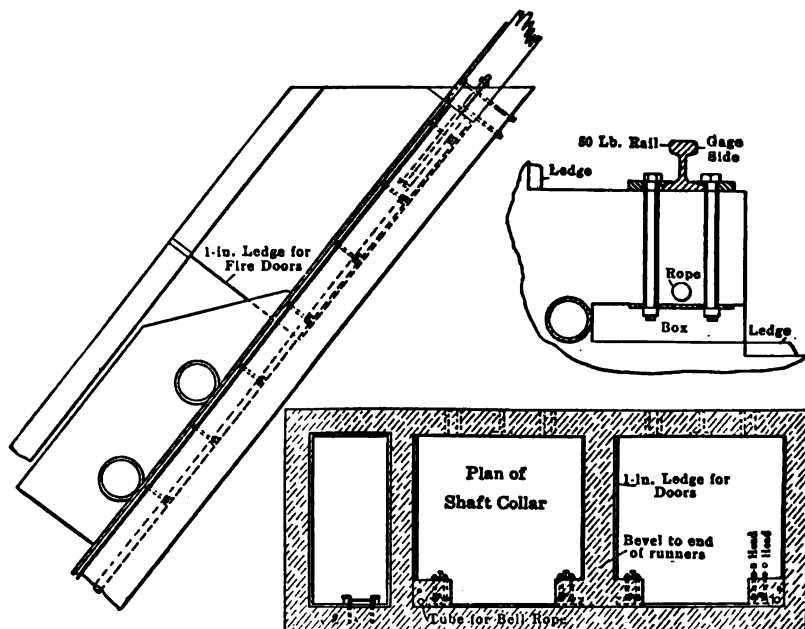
DETAILS OF CONNECTION OF CONCRETE SHAFT RUNNERS WITH WOODEN RUNNERS OF ROCK HOUSE.
